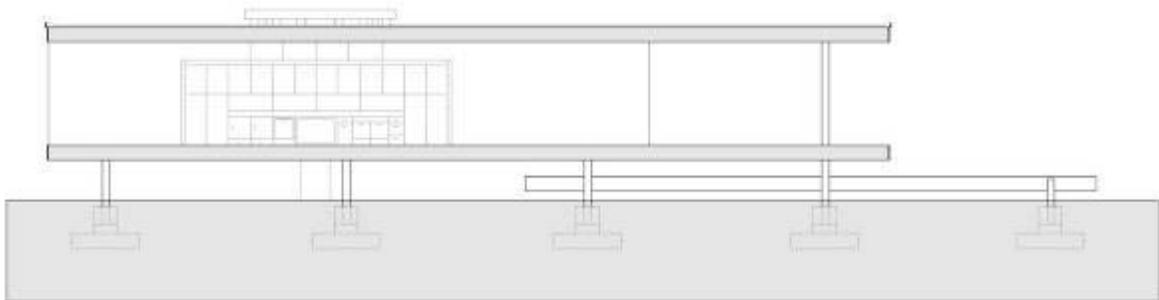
Section drawing of Farnsworth House. Drawn by Jamee Kominsky.
